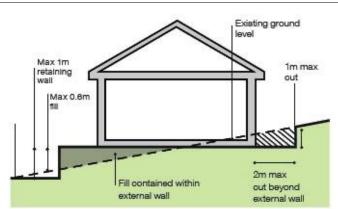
FILL AND EXCAVATION WITH RETAINING WALLS
